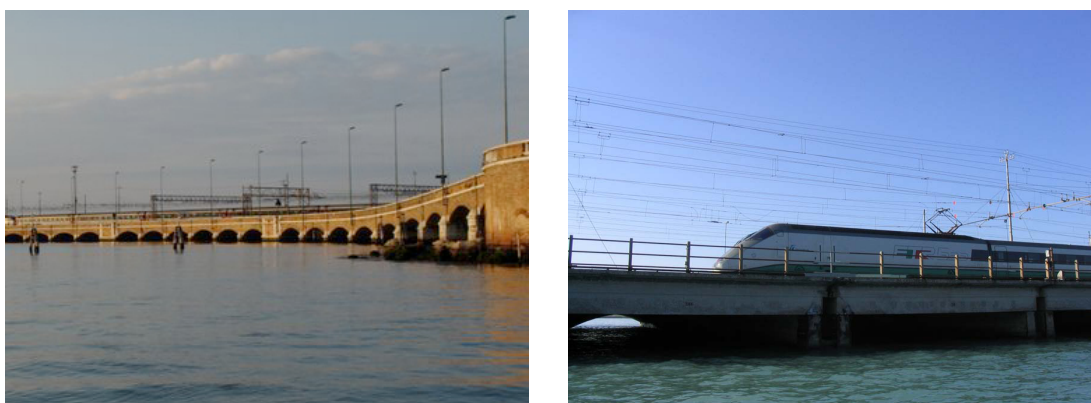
a) The road bridge (left); b) the new rail bridge (right).
